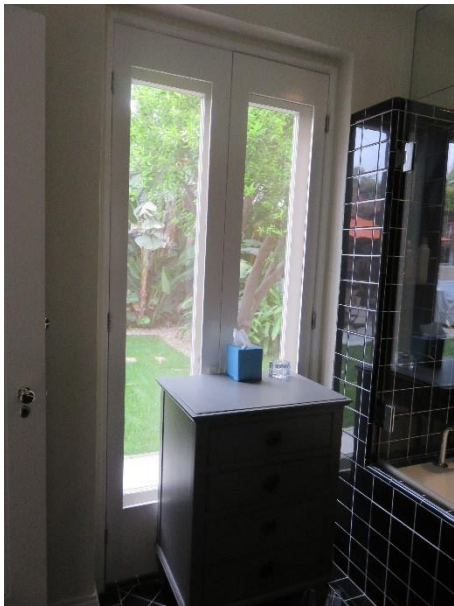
The double doors located on the east wall of the first floor bathroom.
